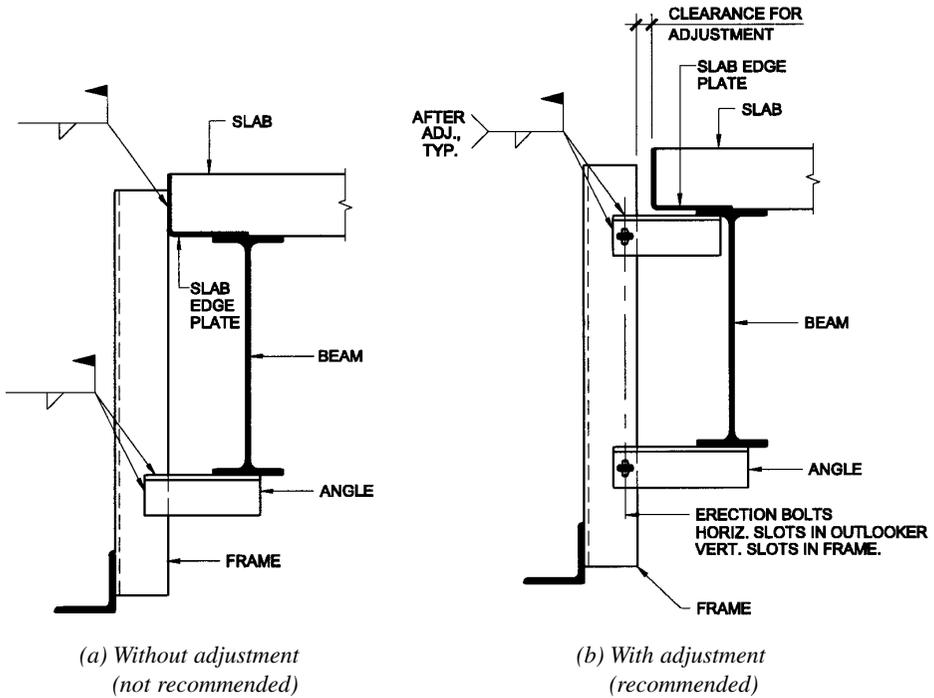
Attaching masonry façade systems to structural steel framing.
